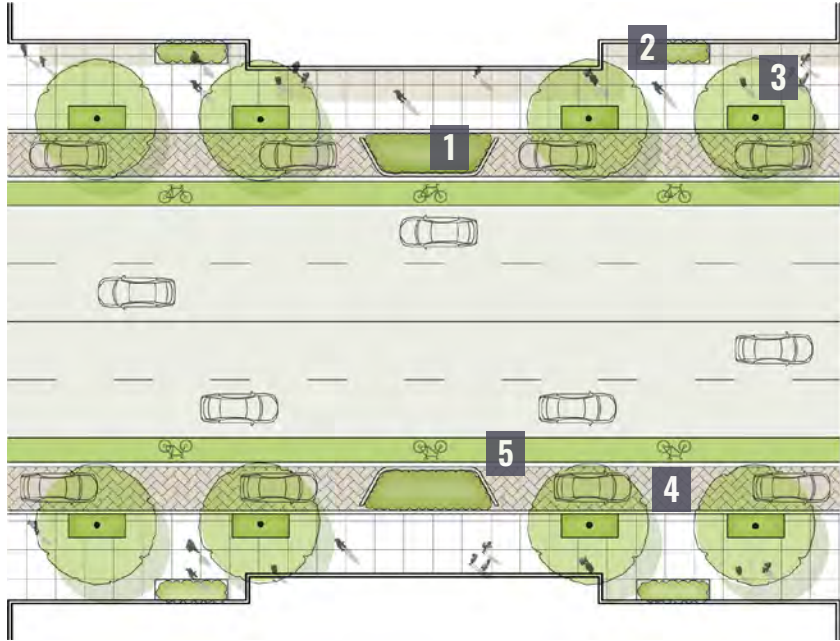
PLAN VIEW OF TYPICAL GREEN STREET RETROFITS IN A COMMERCIAL MAIN STREET
